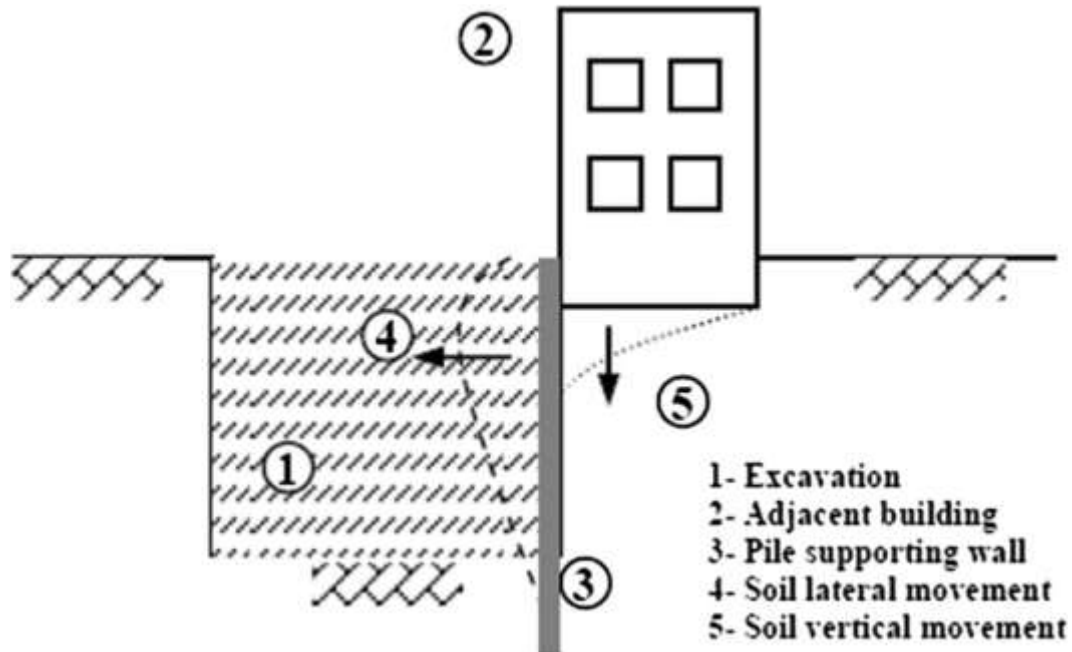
Model of Excavation, adjacent area and building (Ramadan et. al., 2018)
